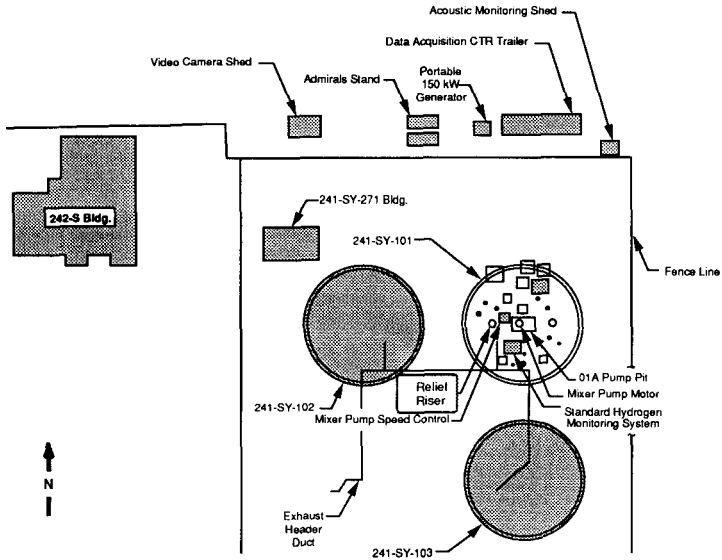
Configuration of the 241-SY Tank Farm.
